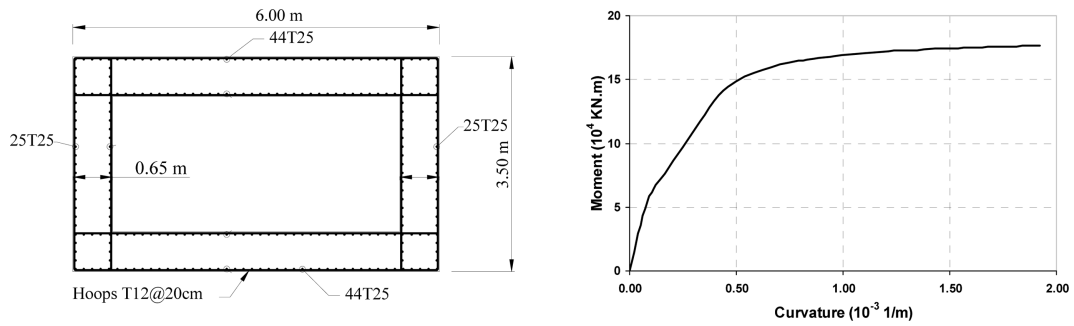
(b) Cross section and its moment curvature curve for the bridge pier (Sample bridge 2)
